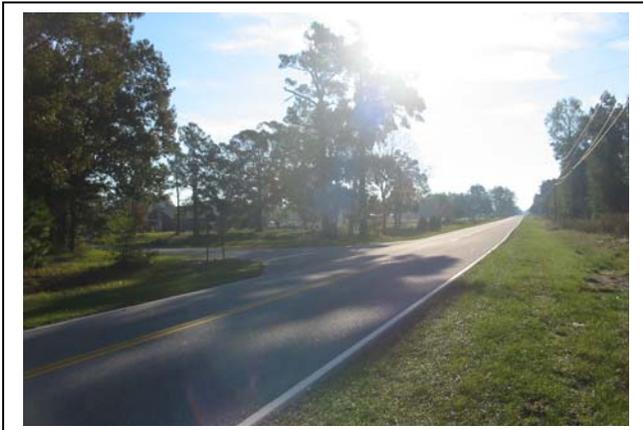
U.S. Highway 176 at intersection with Woolbright Rd.
